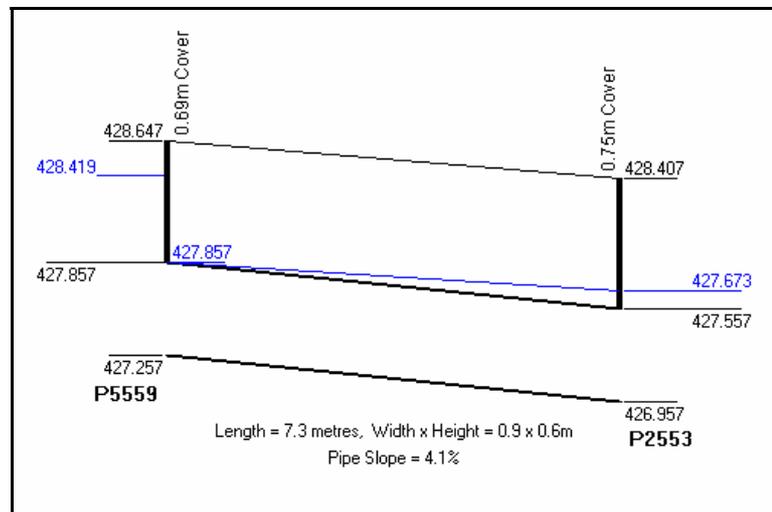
Effect of Reinforced Concrete Box Culvert on HGL
